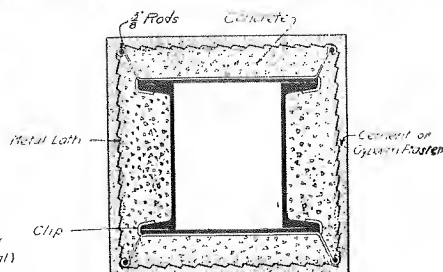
A. Double Layer Plaster Fireproofing of Typical Steel Column; for Single Layer Omit Outer Furring, Lathing, and Plaster. The Fireproofing of "H" Columns Is Similar.
